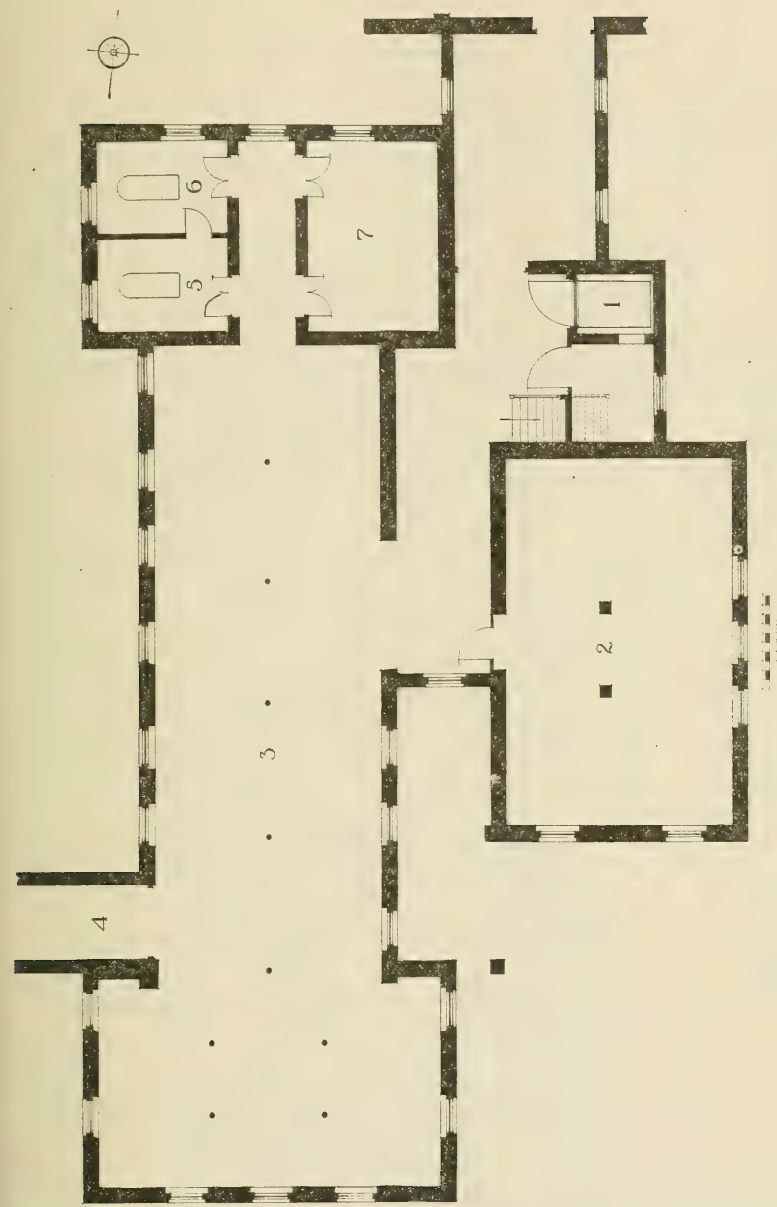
WARDS A and F. PLAN OF BASEMENT FLOOR
